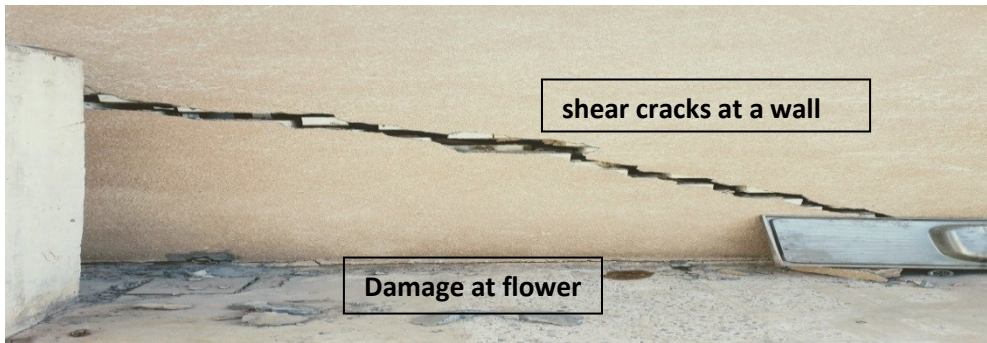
(B) cracks at a wall and ground deformation due to shear stresses
